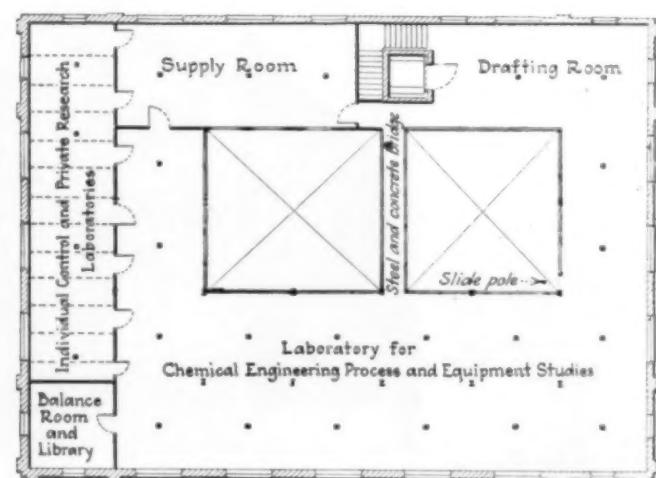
and 5—Floor Plans Showing the Layout of Iowa State's New Chemical Engineering Workshop
